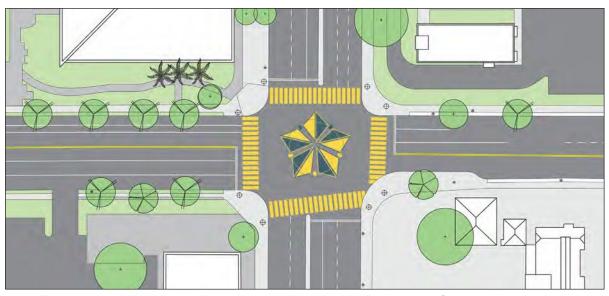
Wilmington Avenue and East 120th/East 119th Street intersection
